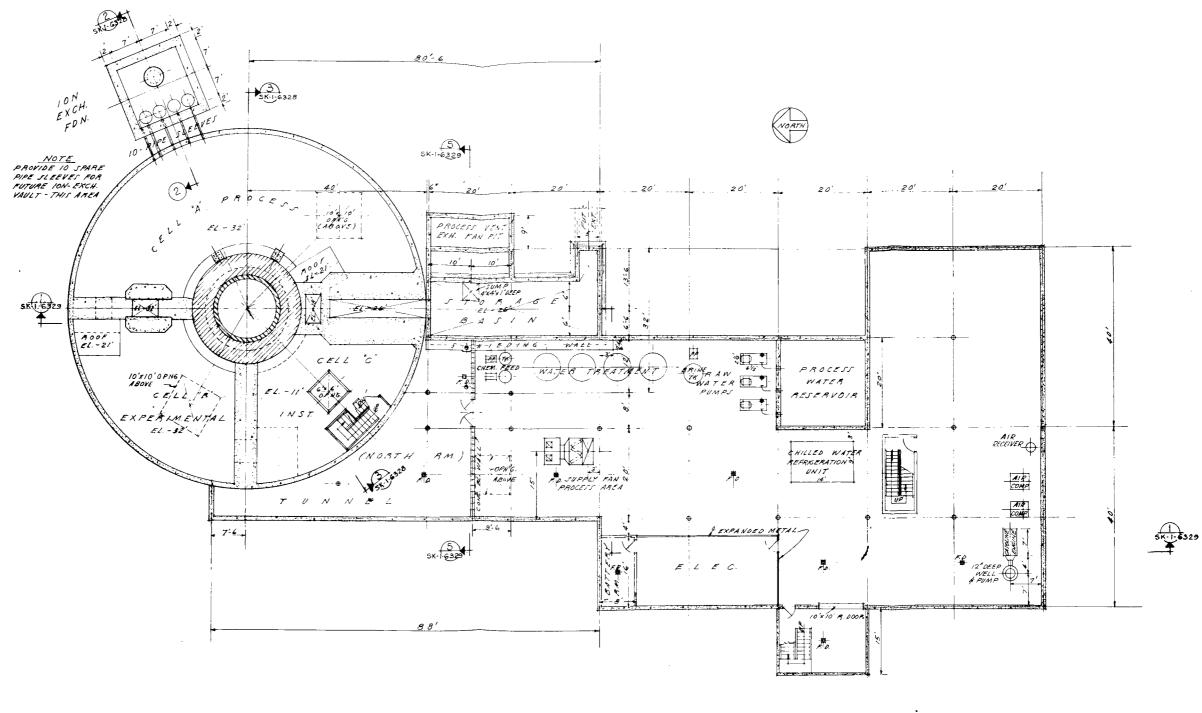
Building Plan at Grade Level (SK-1-6325)
